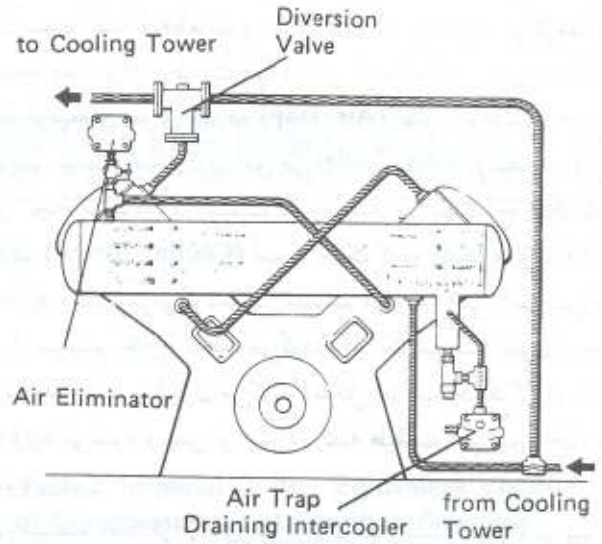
Diversion Valve Controlling Compressor on Closed Circuit Cooling
